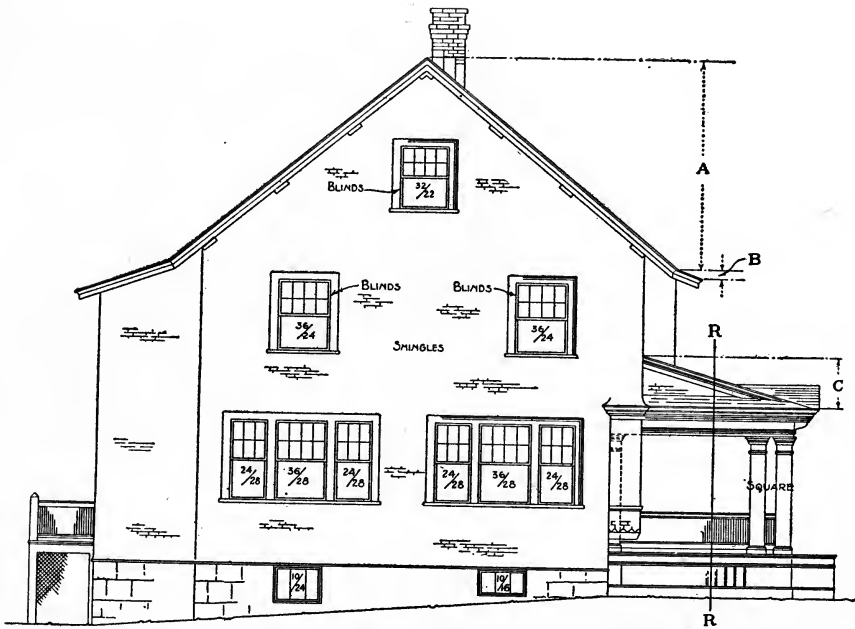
LEFT SIDE OR SOUTHEAST ELEVATION—SCALE  $\frac{1}{12}$  IN. TO THE FOOT
